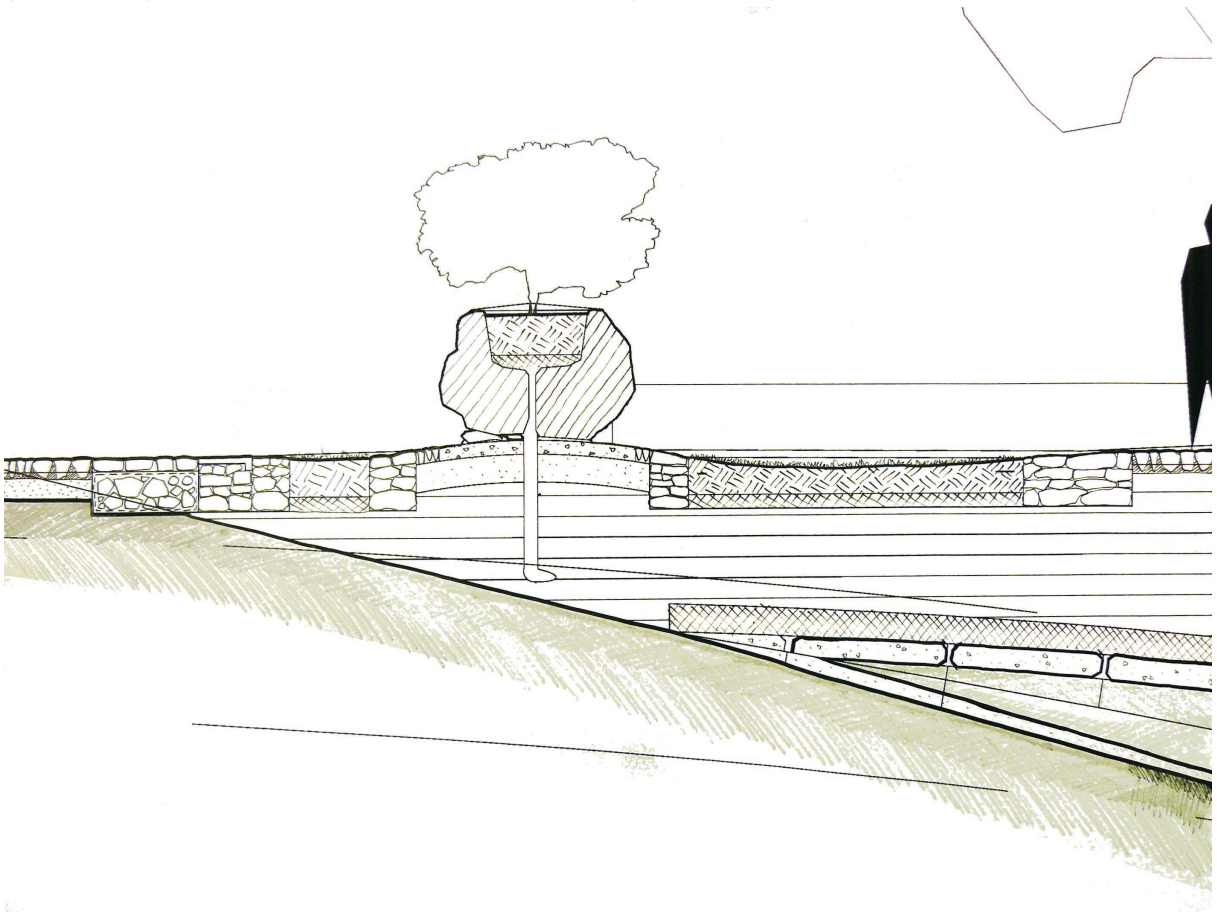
Detail of section PA (not to scale) (obsolete) (Author 2015)
